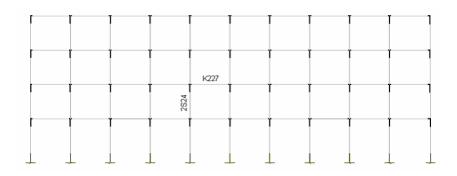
Frame C, Rigid End zones, Example Column and Beam
